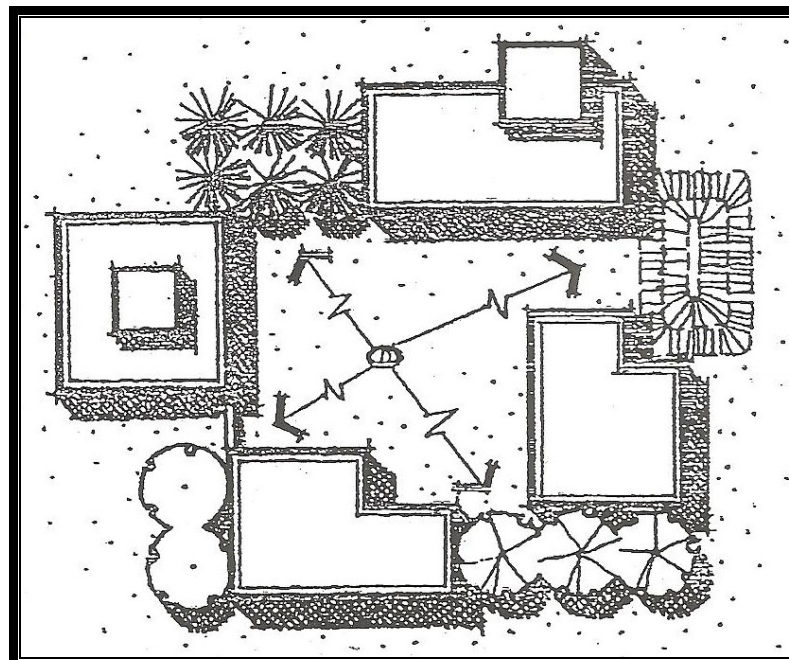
Creating Outdoor Space with Landscape Elements
